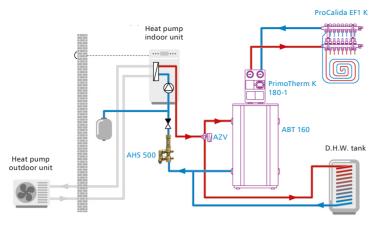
Example installation diagram with heat pump service assembly AHS 500
